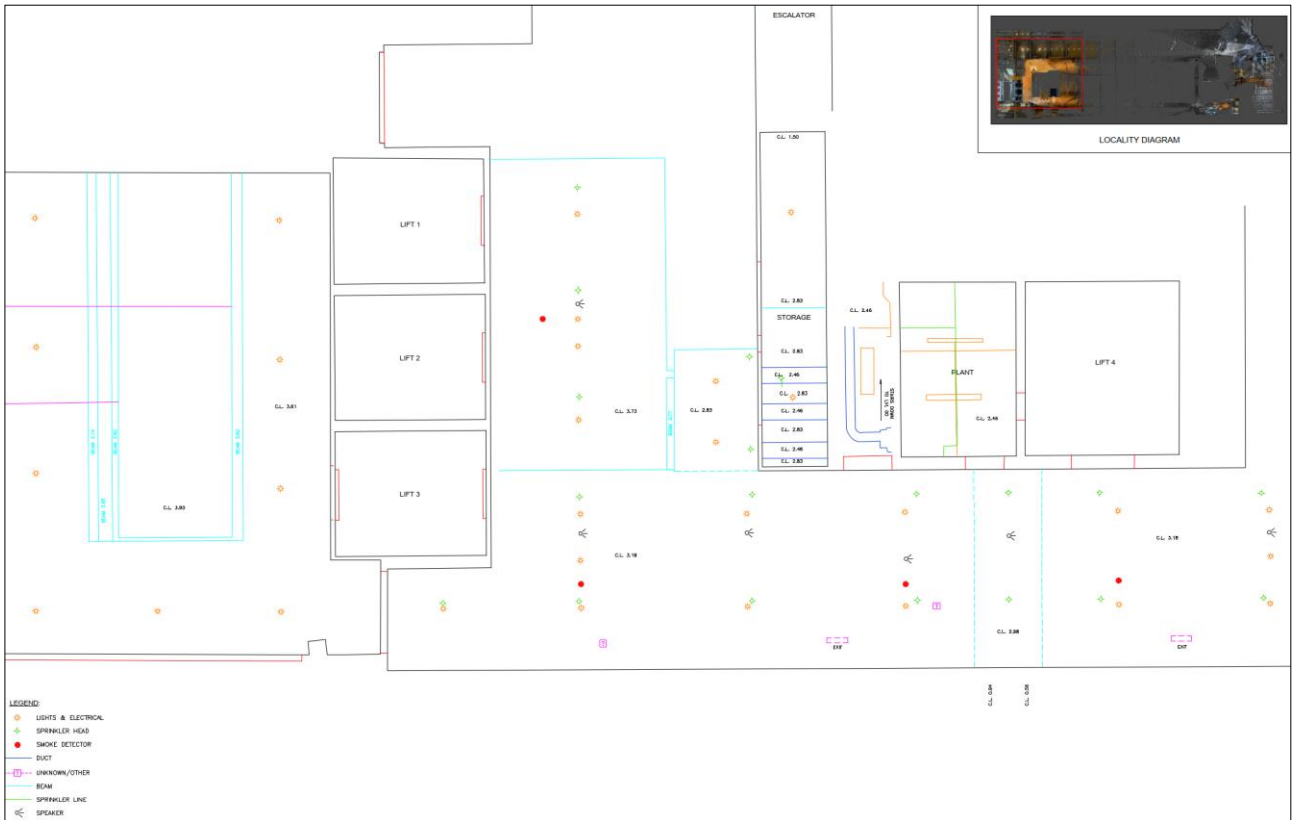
Layout of lift wells and escalators Lifts 1-4 (southern side) (Source: Rygate, 2024)
